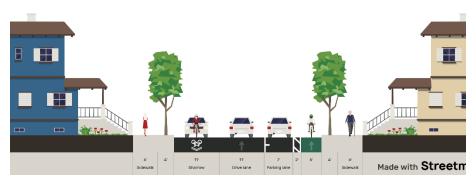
Segment 1 Proposed Cross Section on Bigelow Boulevard from Bayard Street to Centre Avenue (looking north)
